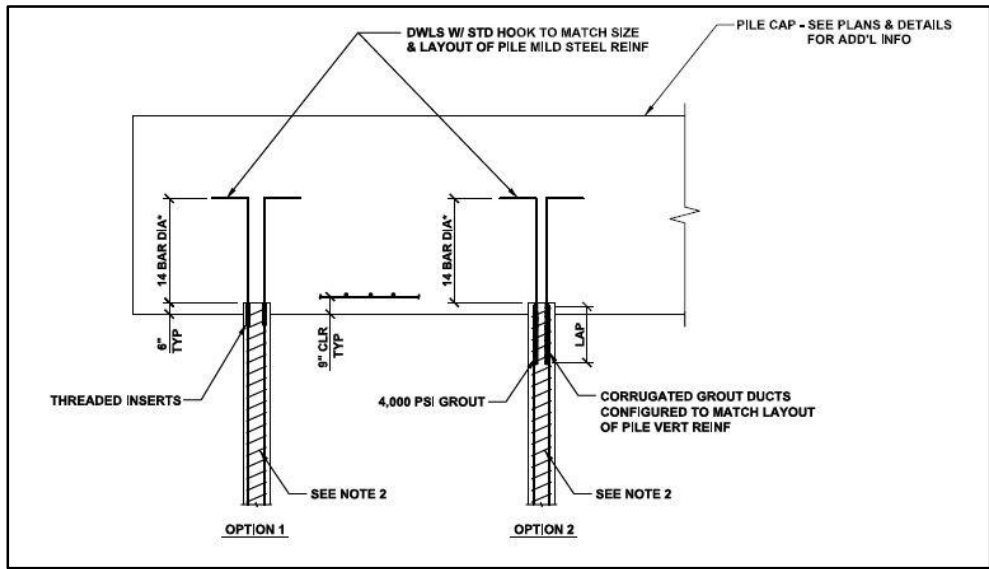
Typical Detail for PCPS Piles at Column Pile Caps
